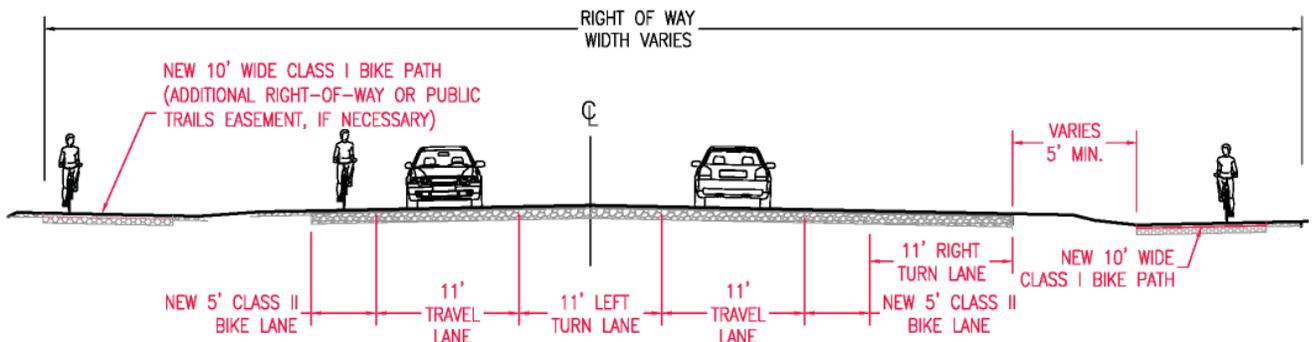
BROCKWAY ROAD - EAST OF HOPE COURT
